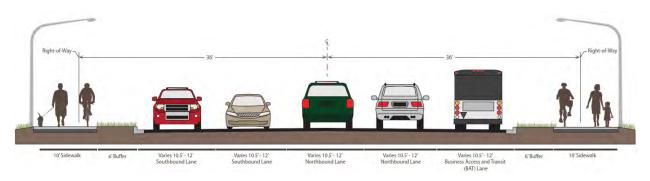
Proposed Typical Section – Warren Avenue Bridge to Callahan Drive
